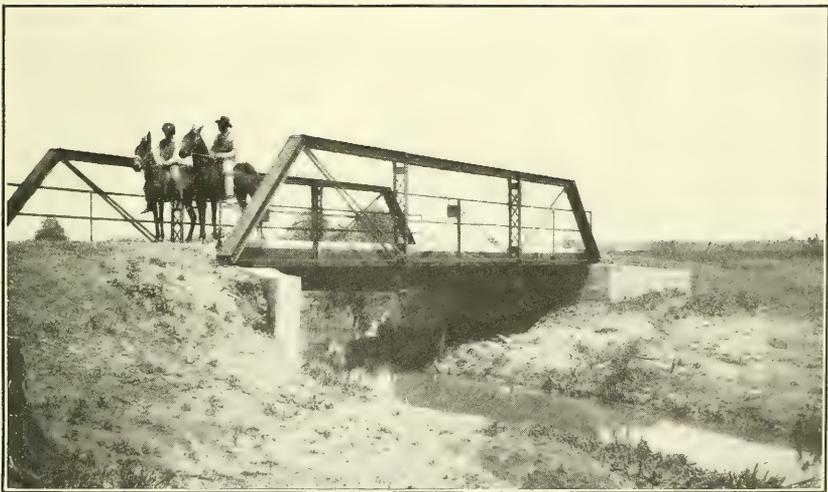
DALLAS COUNTY, ALA. NEW STEEL BRIDGE WITH CONCRETE FLOOR BUILT IN 1911 TO REPLACE THE BRIDGE IN FIGURE 1.
